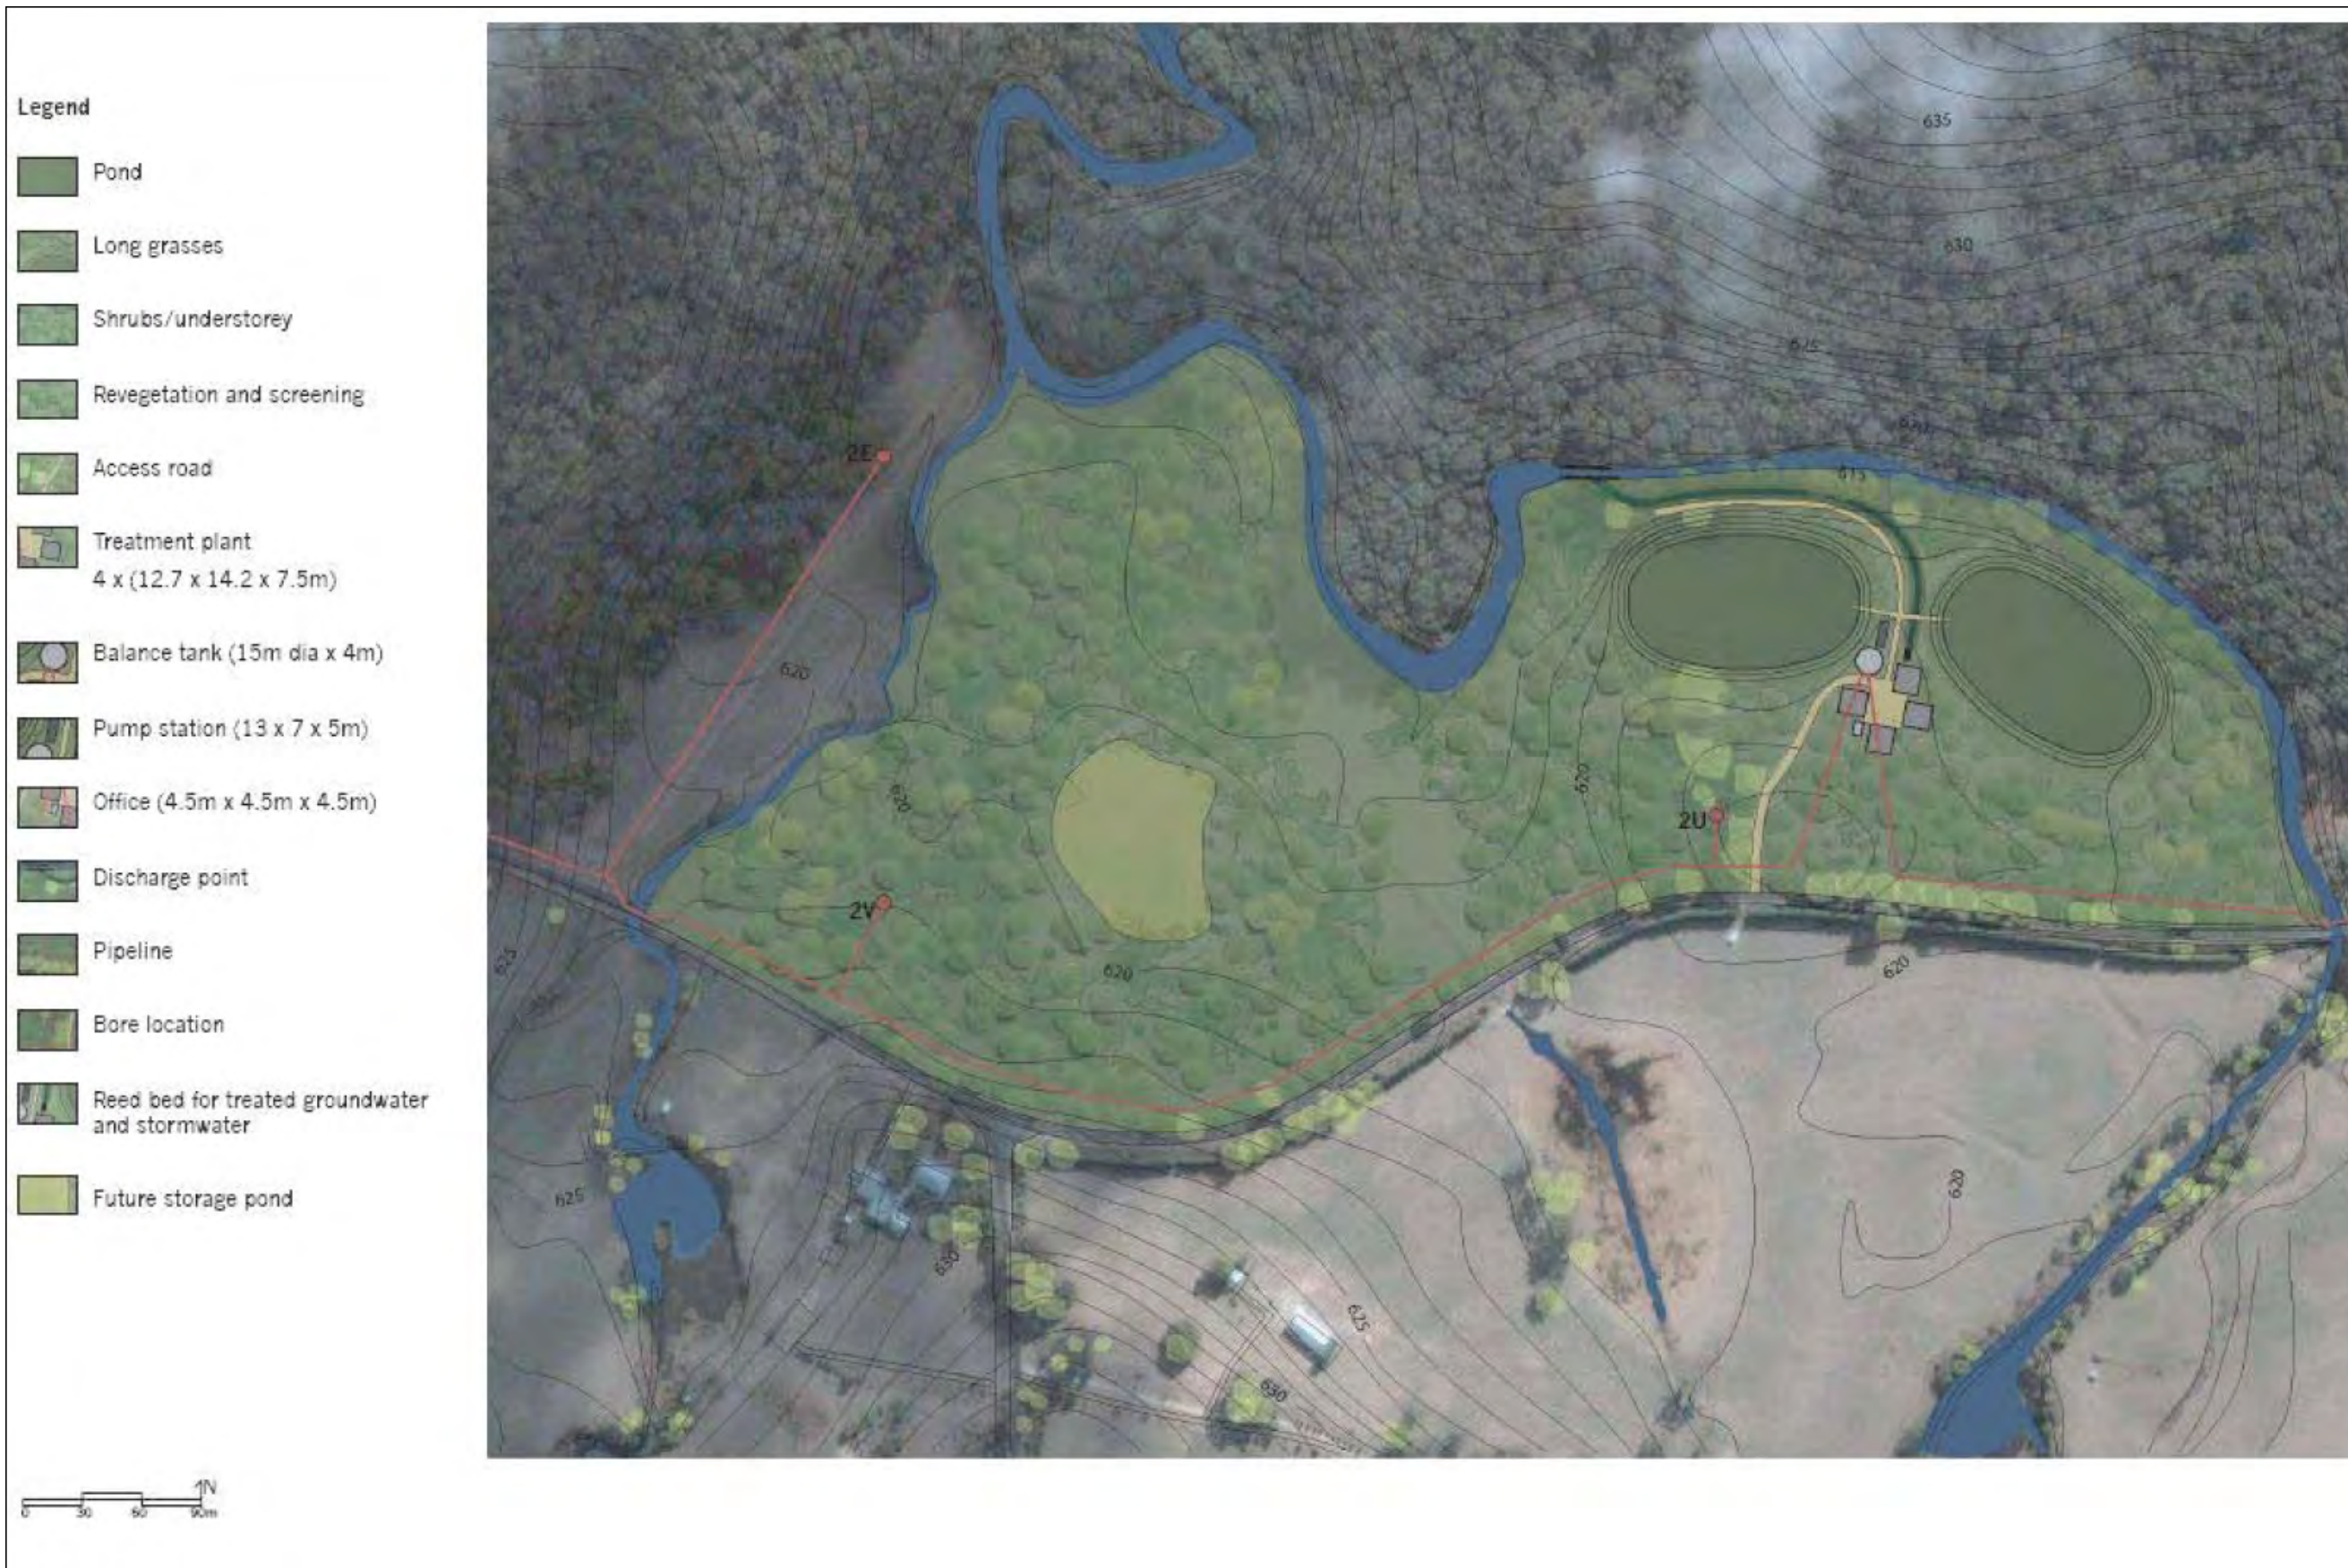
Layout of water treatment plant at Tourist Road discharge
